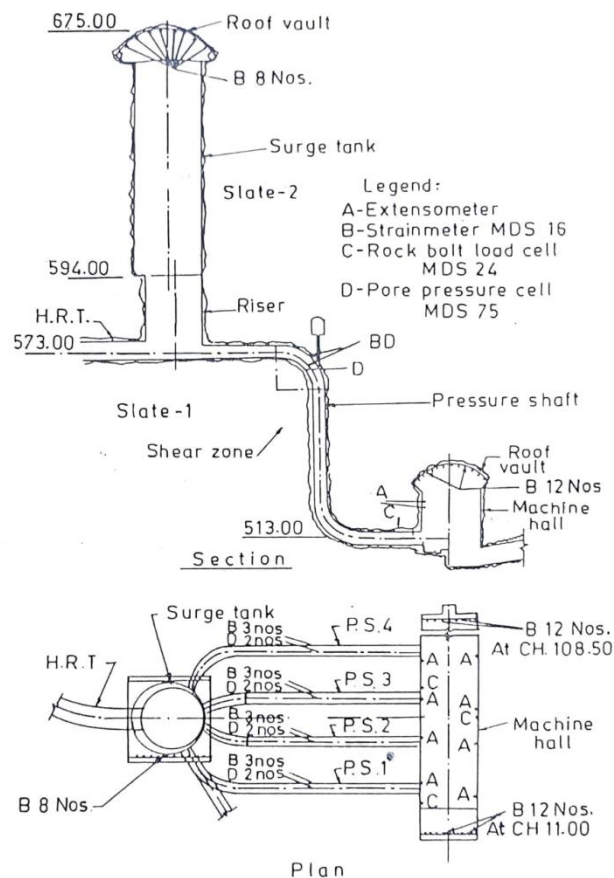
Schematic diagram showing the cross section and plan of the underground powerhouse complex with instrumentation layout
